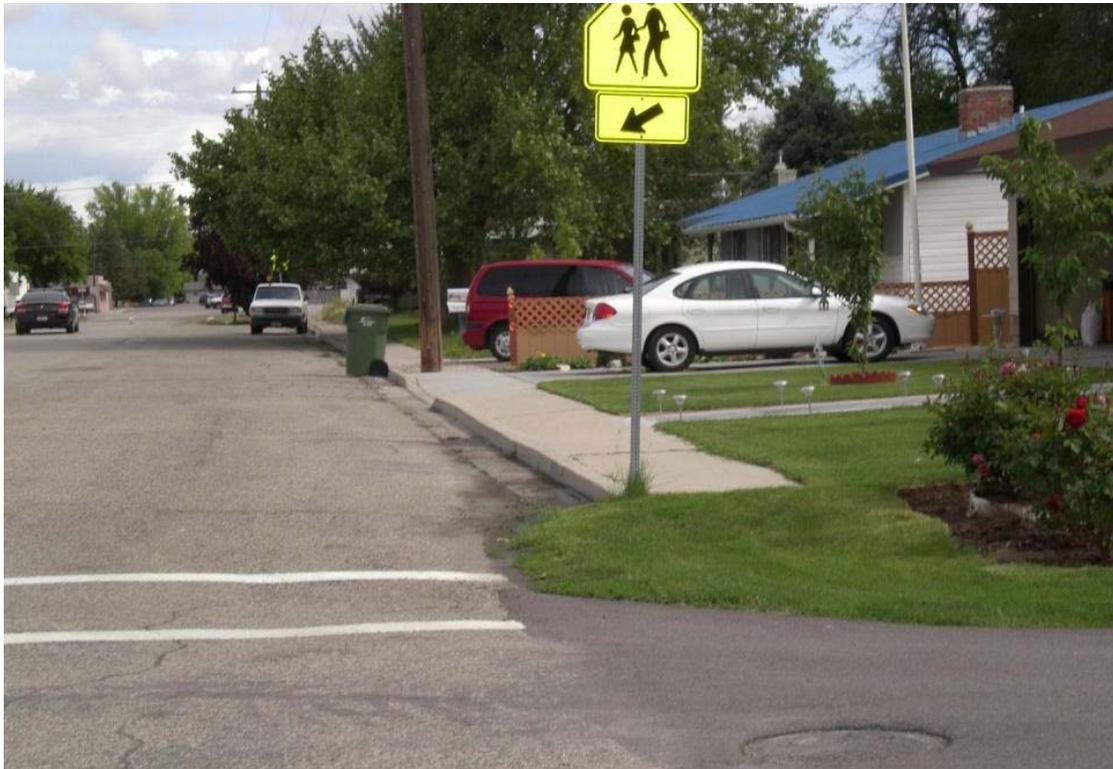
Example of non-compliant sidewalk. Location: Section 2-P(2).
